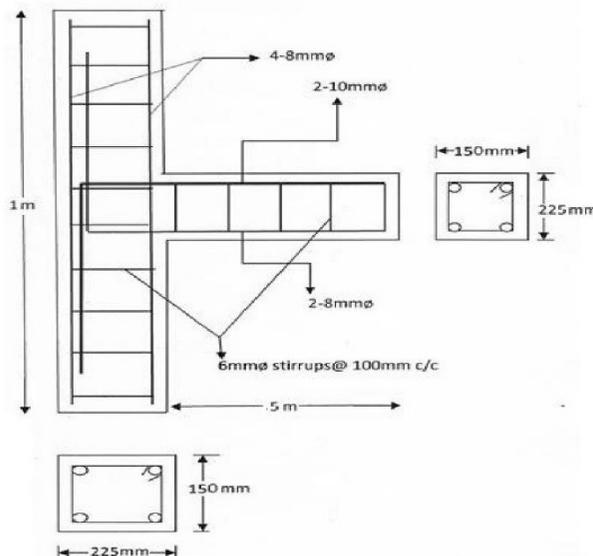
Reinforcement Detailing of Beam Column Joint
